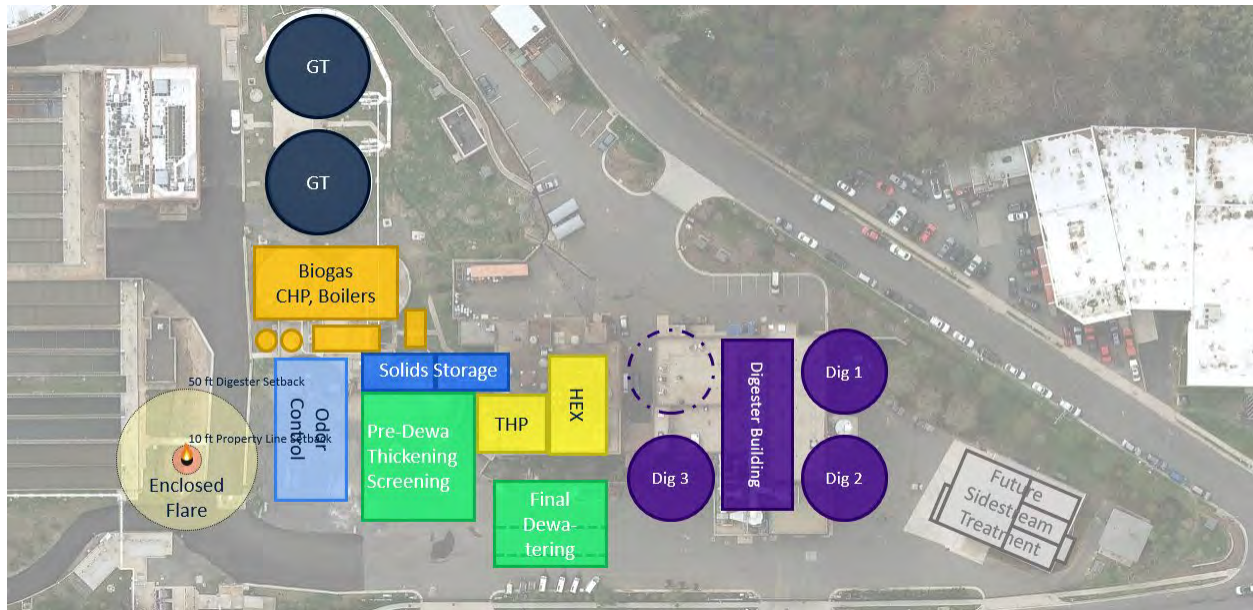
Preliminary Site Layout, Alternative 2: New Dewatering Facility
